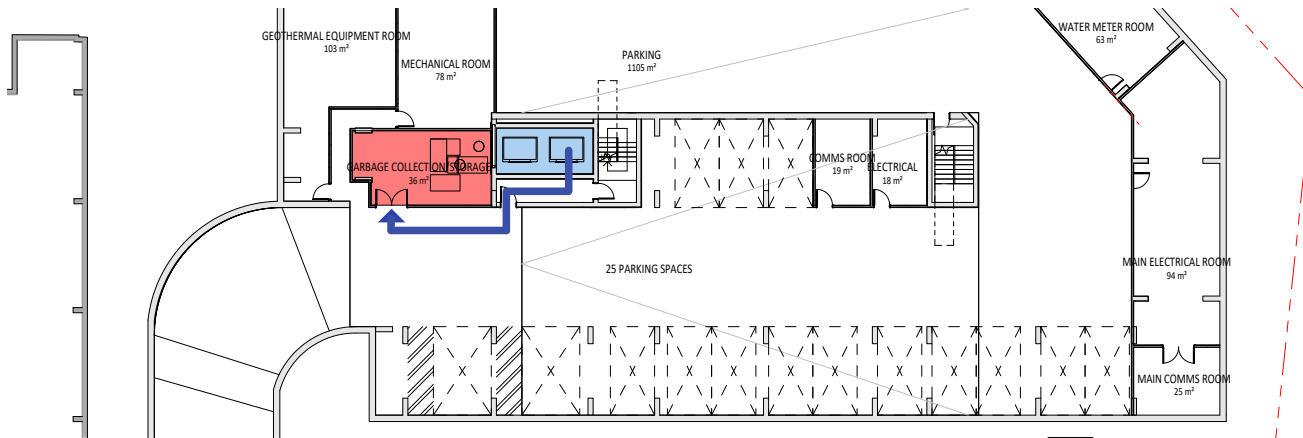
Building 1 Lower Level - Townhome Pedestrian Route to Garbage Collection & Storage Room
